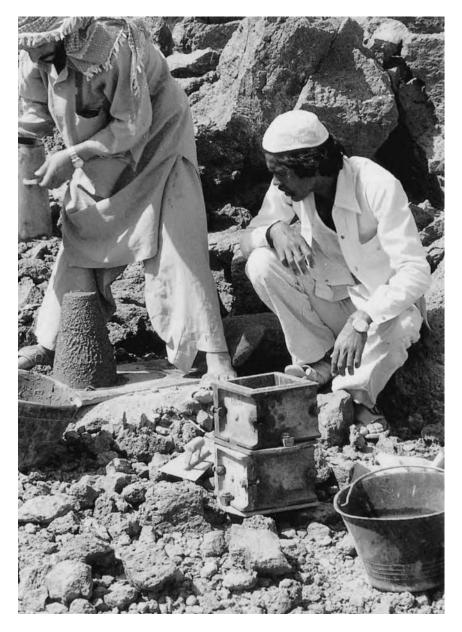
Concrete cube and slump cone samples being prepared – Yanbu-Medina 380 kV transmission line, Saudi Arabia (courtesy of Balfour Beatty Projects and Engineering)
